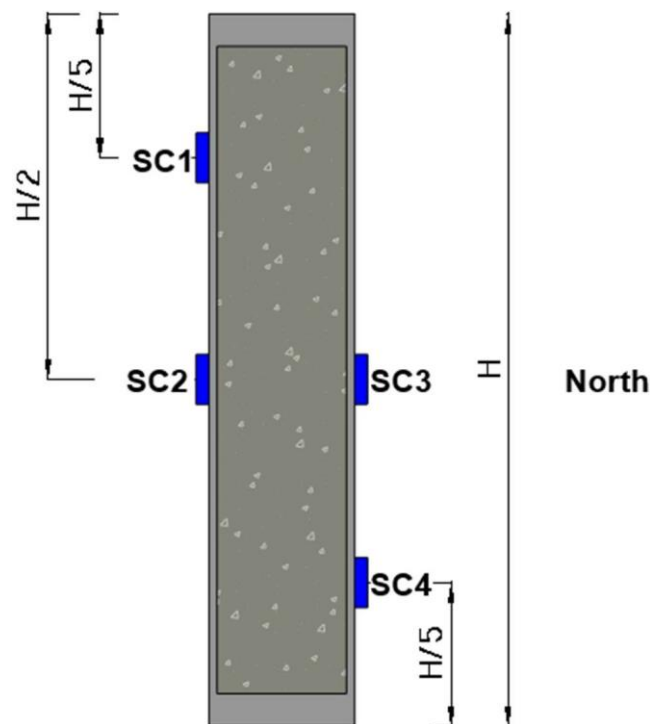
Position of the electrical strain gauge on the intermediate concrete bridge at the center of the panel.
